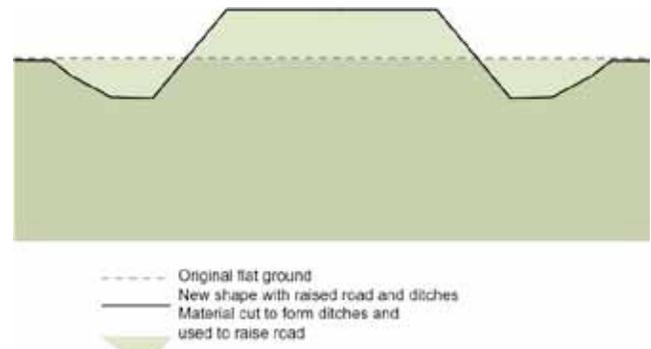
Cross section of a typical raised road with ditches created on both sides for drainage.
